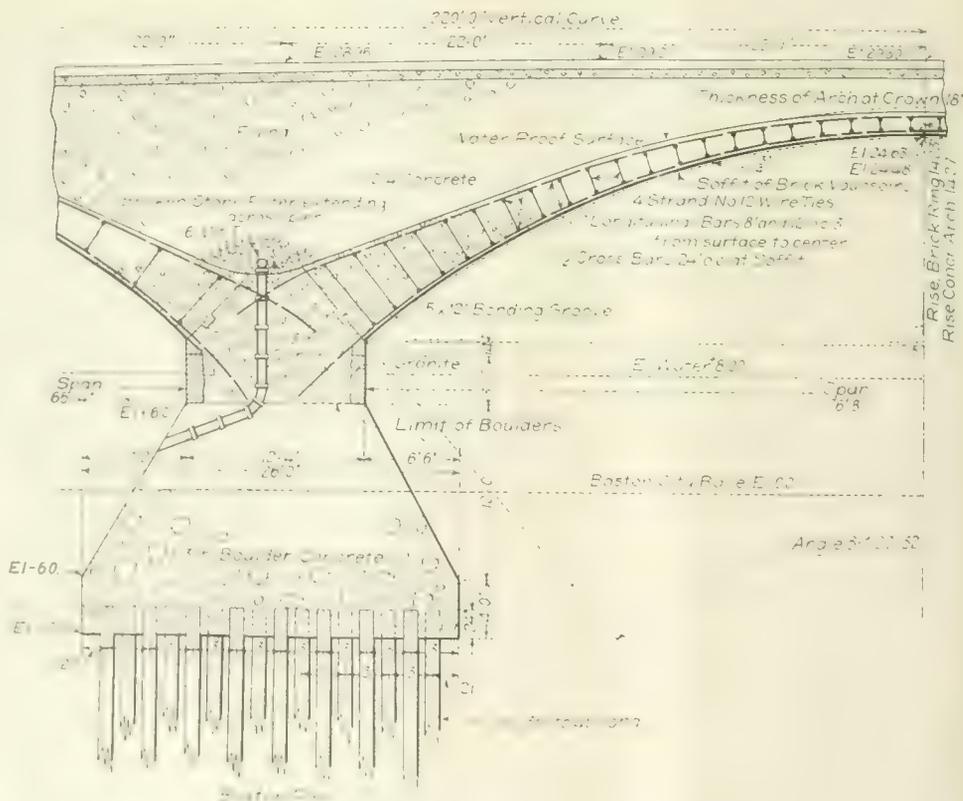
Cross Section of Pier and Half Longitudinal Section of 76-ft. 8-in. Central Span of Larz Anderson Bridge.
